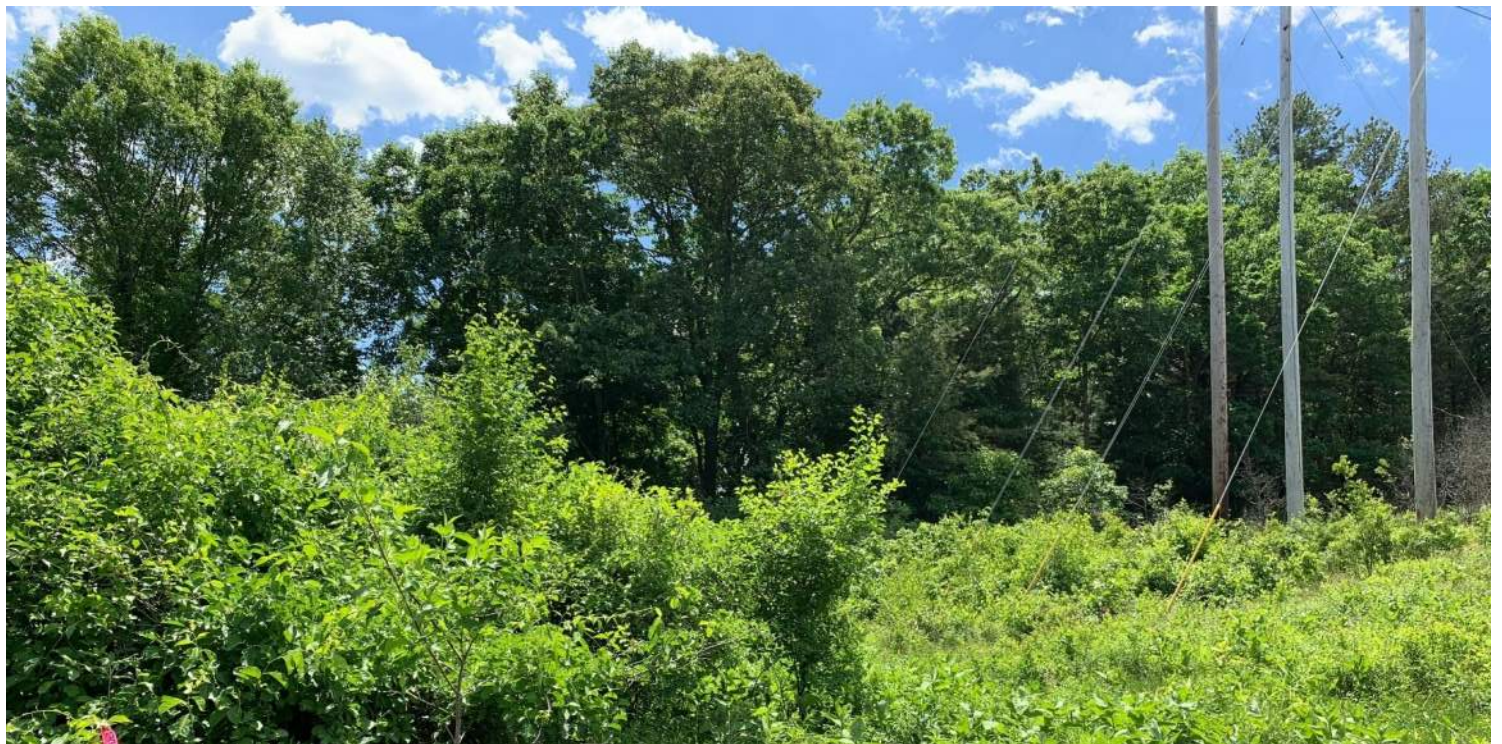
View of the wetland near Structure 97 on the S145E Line, where the proposed soil boring and work pad are within the 100-foot Buffer Zone to BVW, along with Surface Water Protection Zone looking southwest
